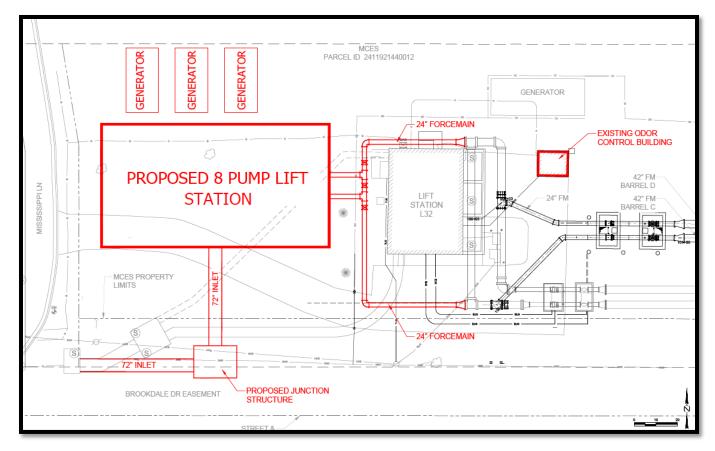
Site Plan for Alternative 2: New Lift Station on West Side of River
